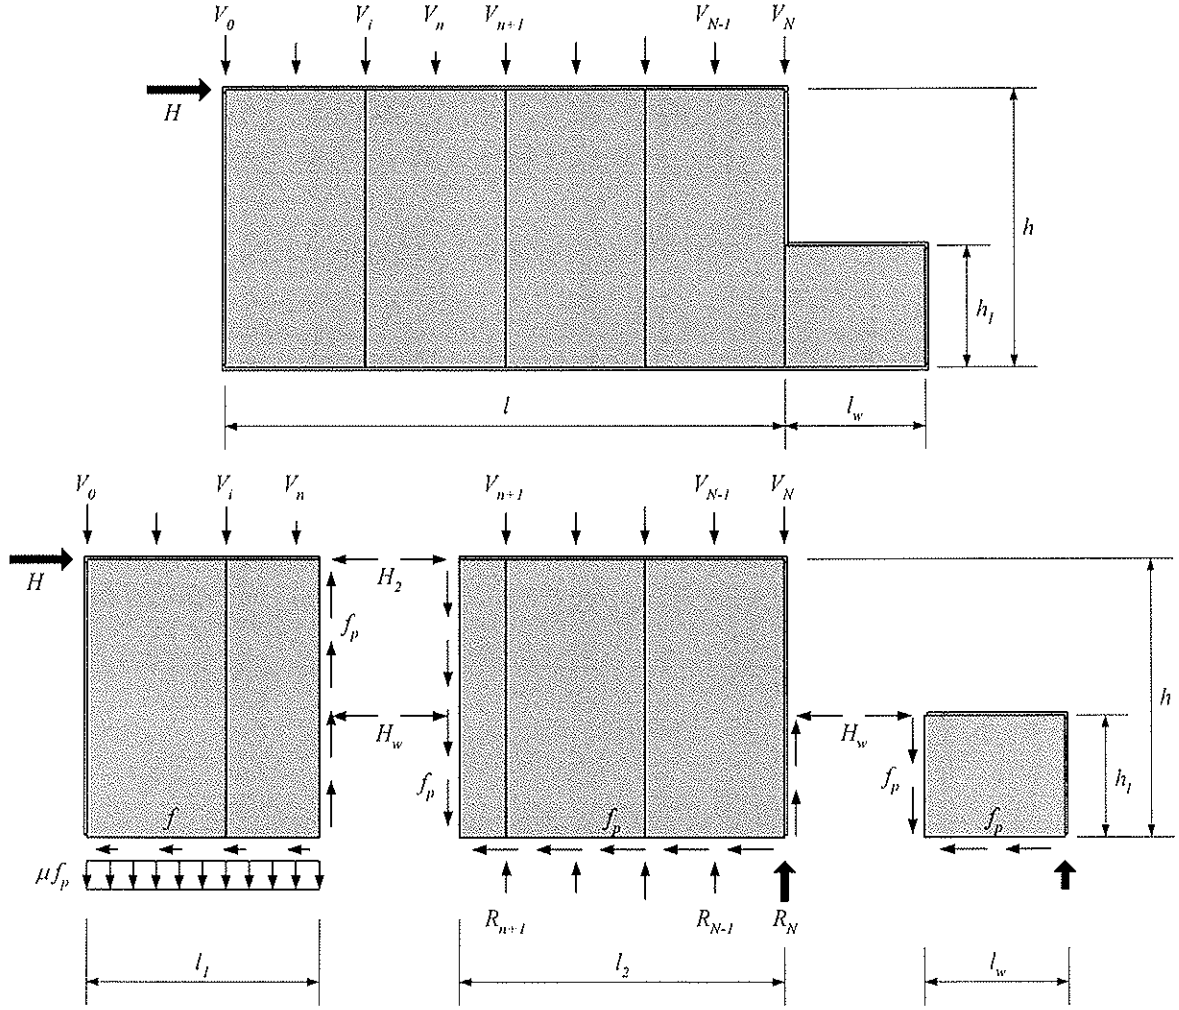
Forces acting on a wall diaphragm with fully anchored bottom rail but without tie-downs. The plastic capacity has been attained in the section l_1 from the leading stud.
